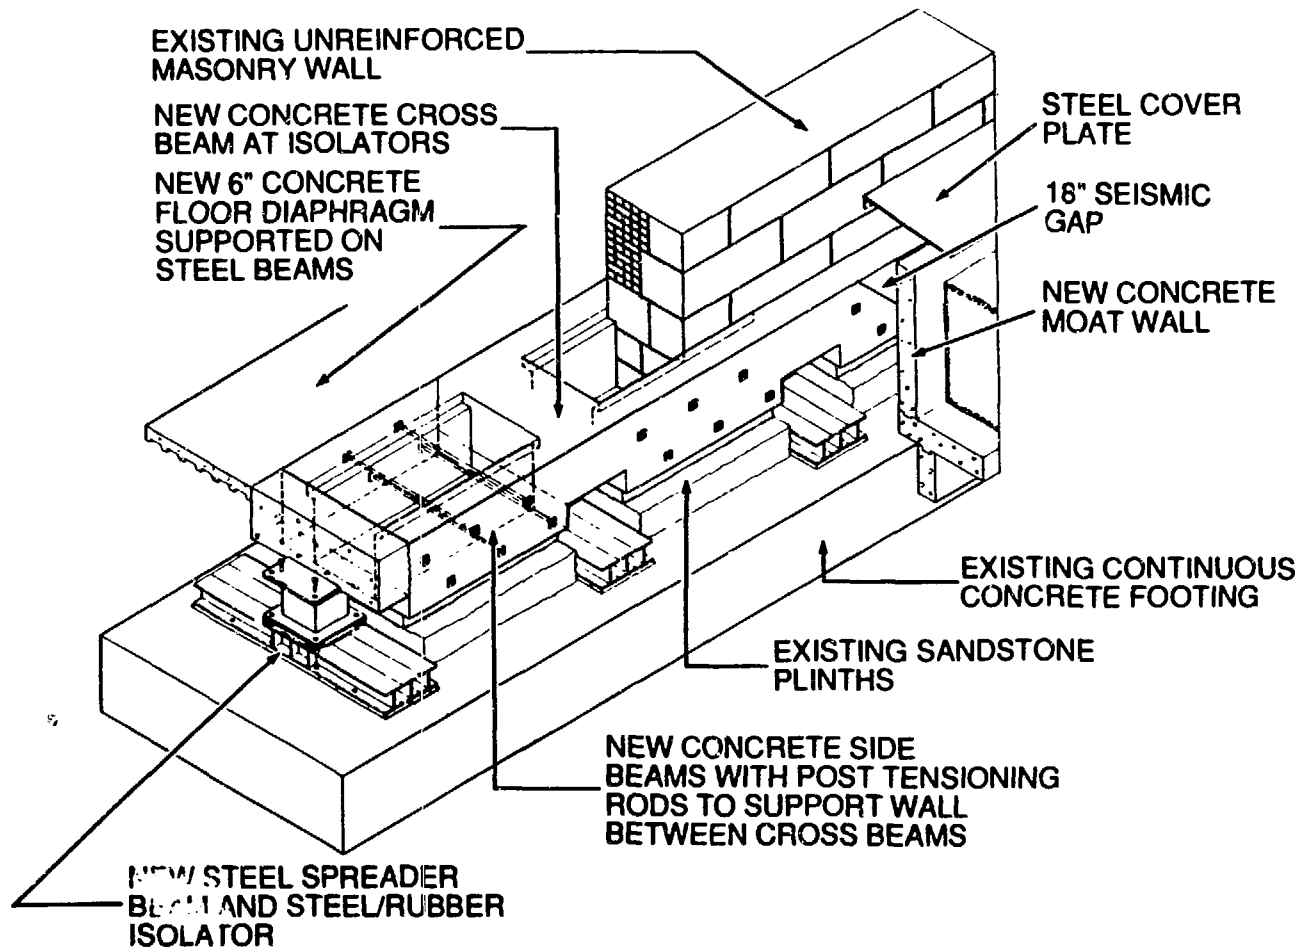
Isometric Showing how Isolators are Installed at Exterior Walls
